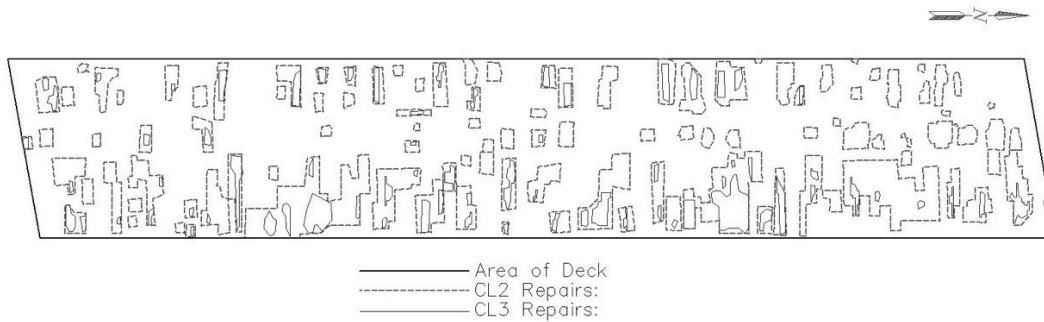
Layout plan depicting the delamination survey for the Forest River South Bound bridge
